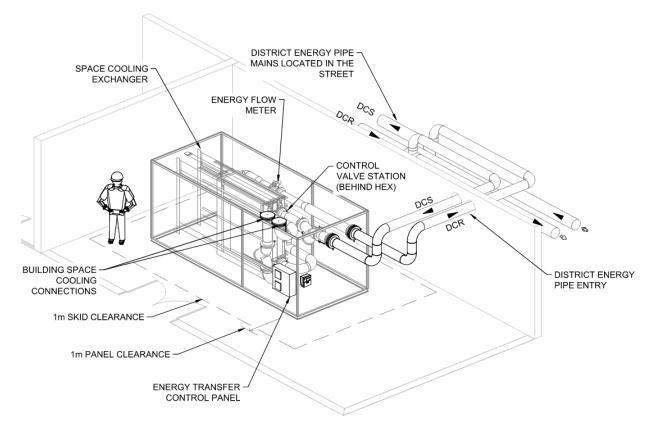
TYPICAL COOLING ETS INSTALLATION IN BUILDING
